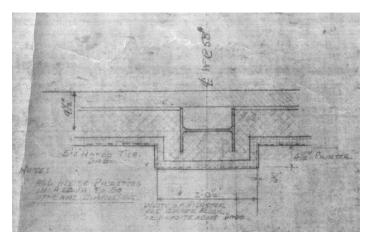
Anticipated masonry pilaster detail at perimeter steel columns (c.1951).
